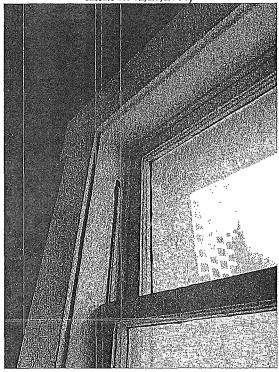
Detail photograph of typical window trim and sash configuration (photograph was taken on 02/27/2018).
